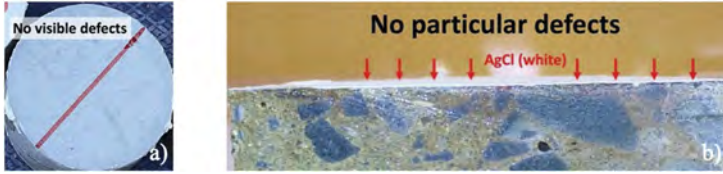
Specimen with no visible defects: (a) before cutting and (b) after AgNO₃ spray.
